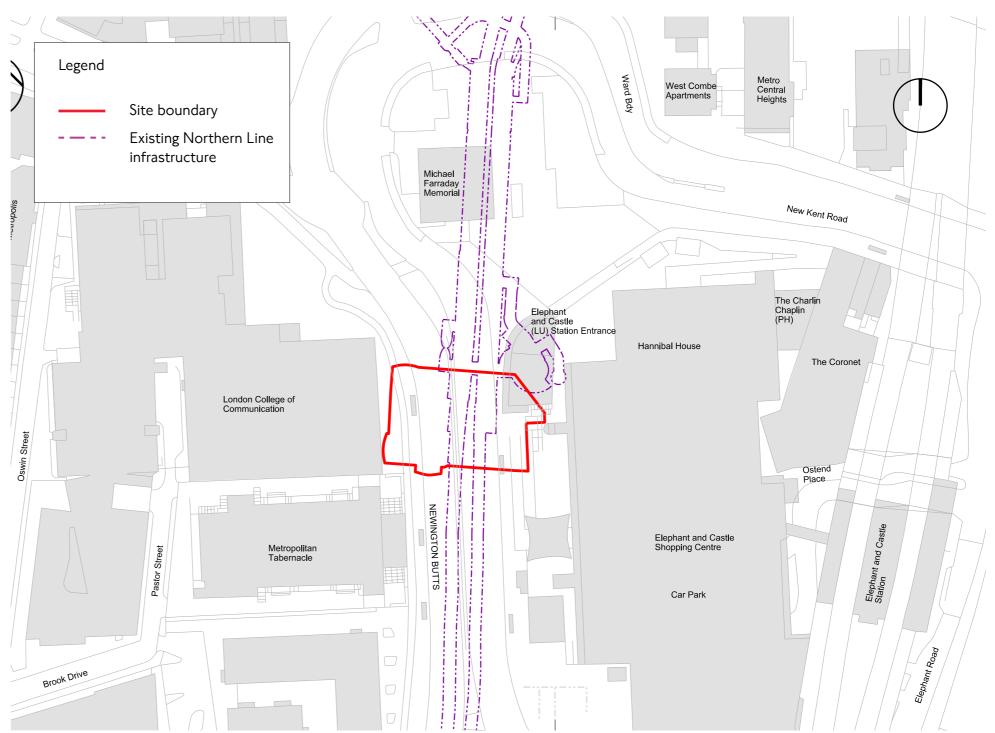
Context plan showing the existing Northern Line station and tunnels (shown in purple) and the application site boundary (shown in red). All works are underground
